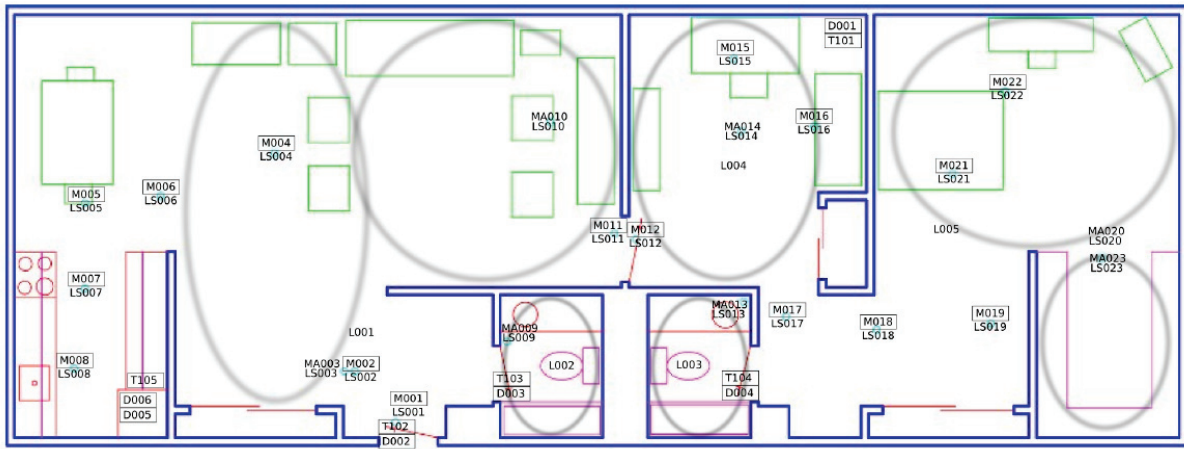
CASAS smart home floor plan and sensor layout (Dawadi, Cook, and Schmitter-Edgecombe 2016)
